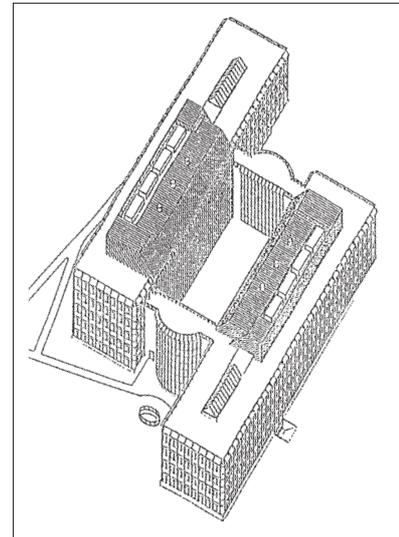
Bird's eye view of the DOW building with two office wings facing onto an open courtyard
